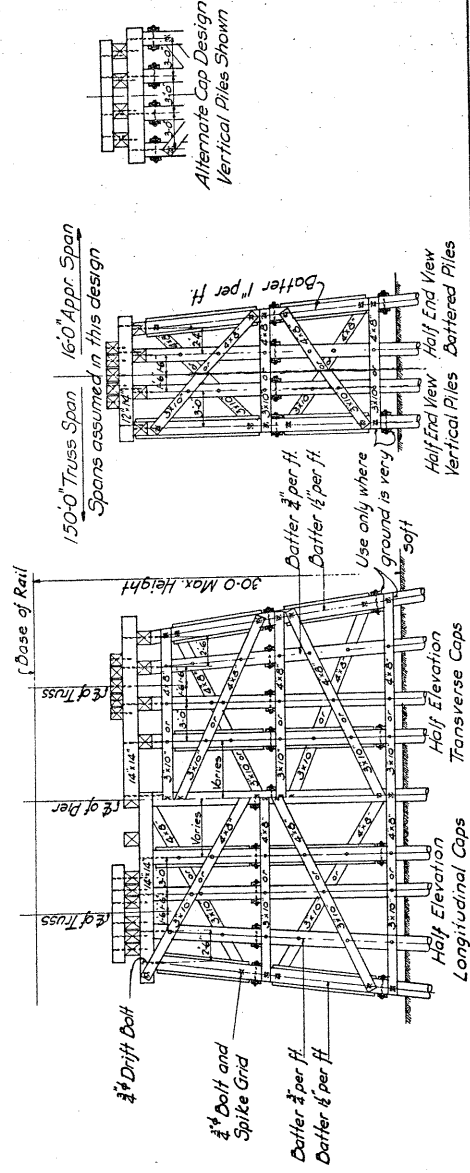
Recommended Practice for Creosoted Timber Pile Piers for Long Spans, E-60 Loading. Pier for 150-ft. Span and Trestle Approach.
